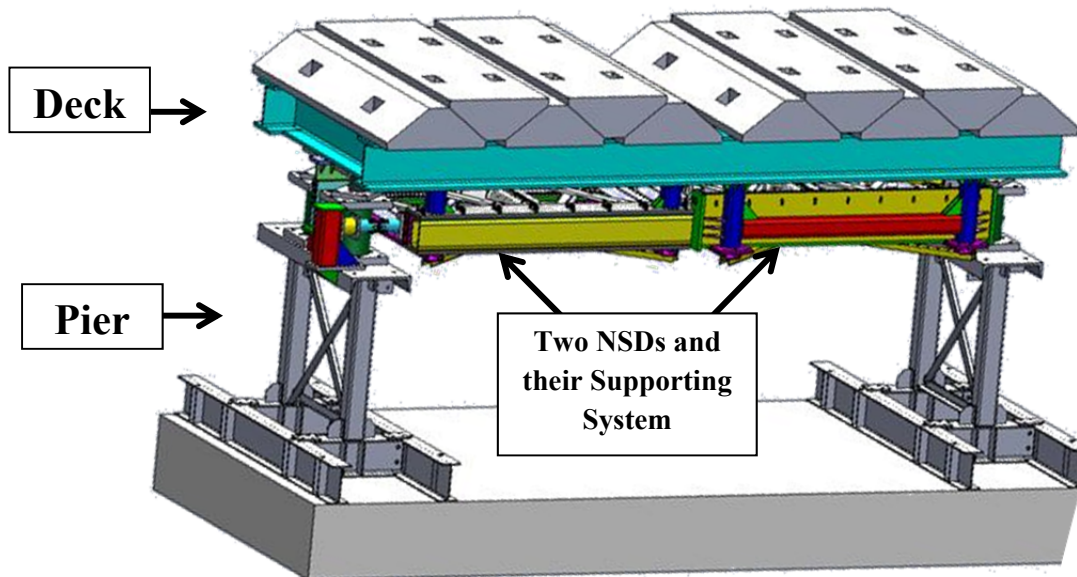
Detailed 3D model of quarter-scale bridge test specimen
